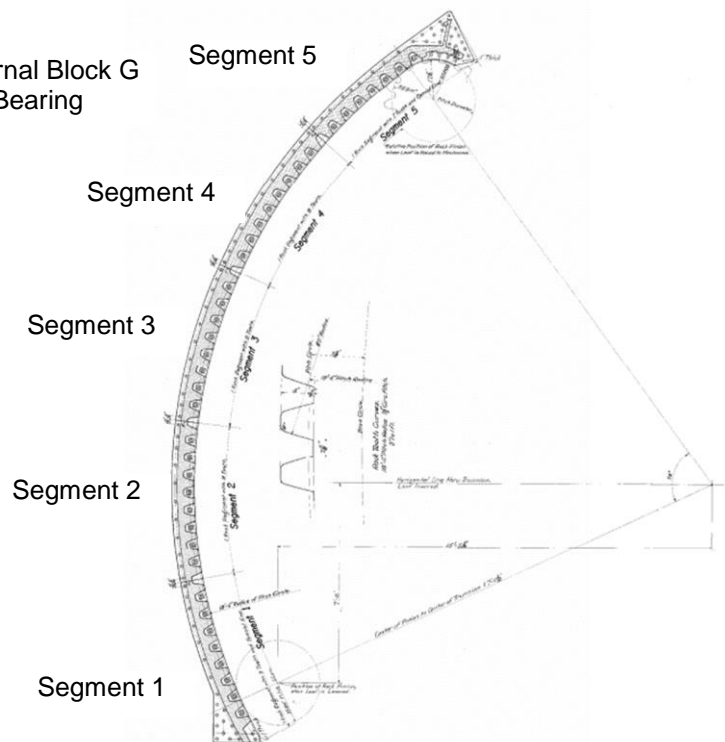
Typical rack segment layout and naming convention taken from the original design drawings.
